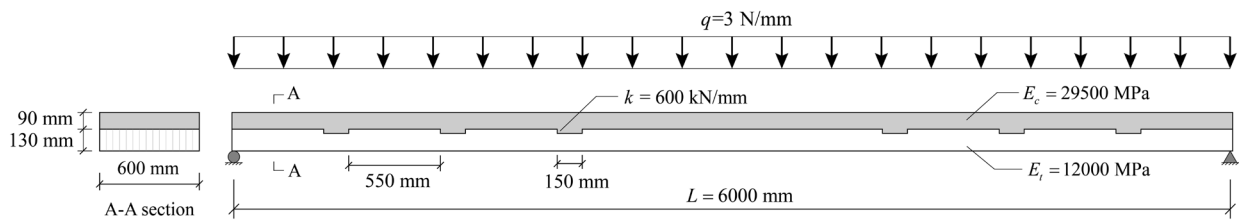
MTP-concrete composite floor connected with notches under a uniformly distributed load
